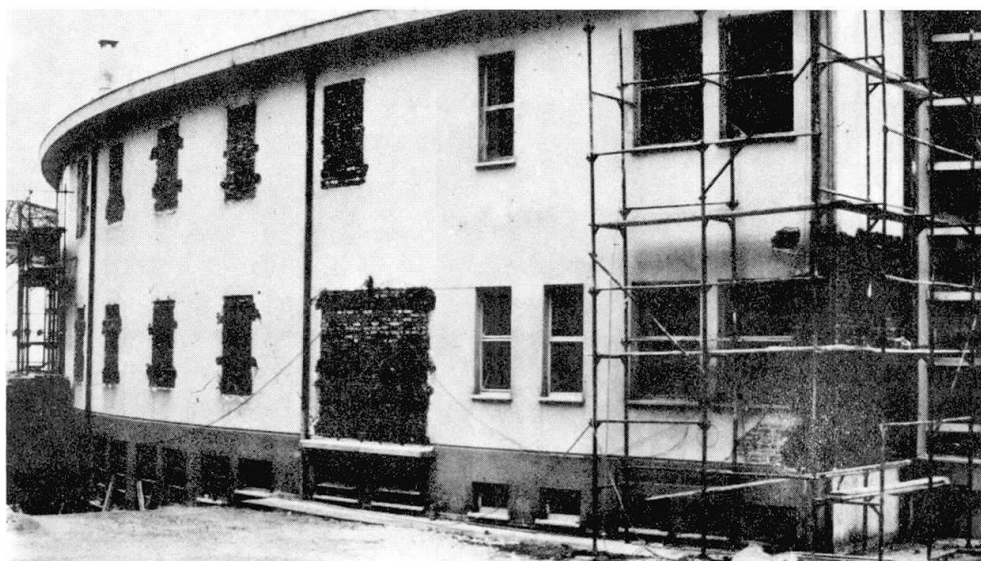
(after September 15th): Business building SBUELZ in Tricesimo. To strengthen the carrying capacity, the door and window openings were walled in. The vibration behaviour of the building was so improved that, during renewed earthquake stress hardly any further damage occurred as opposed to the destruction which occurred during the earthquake of May 6th.
